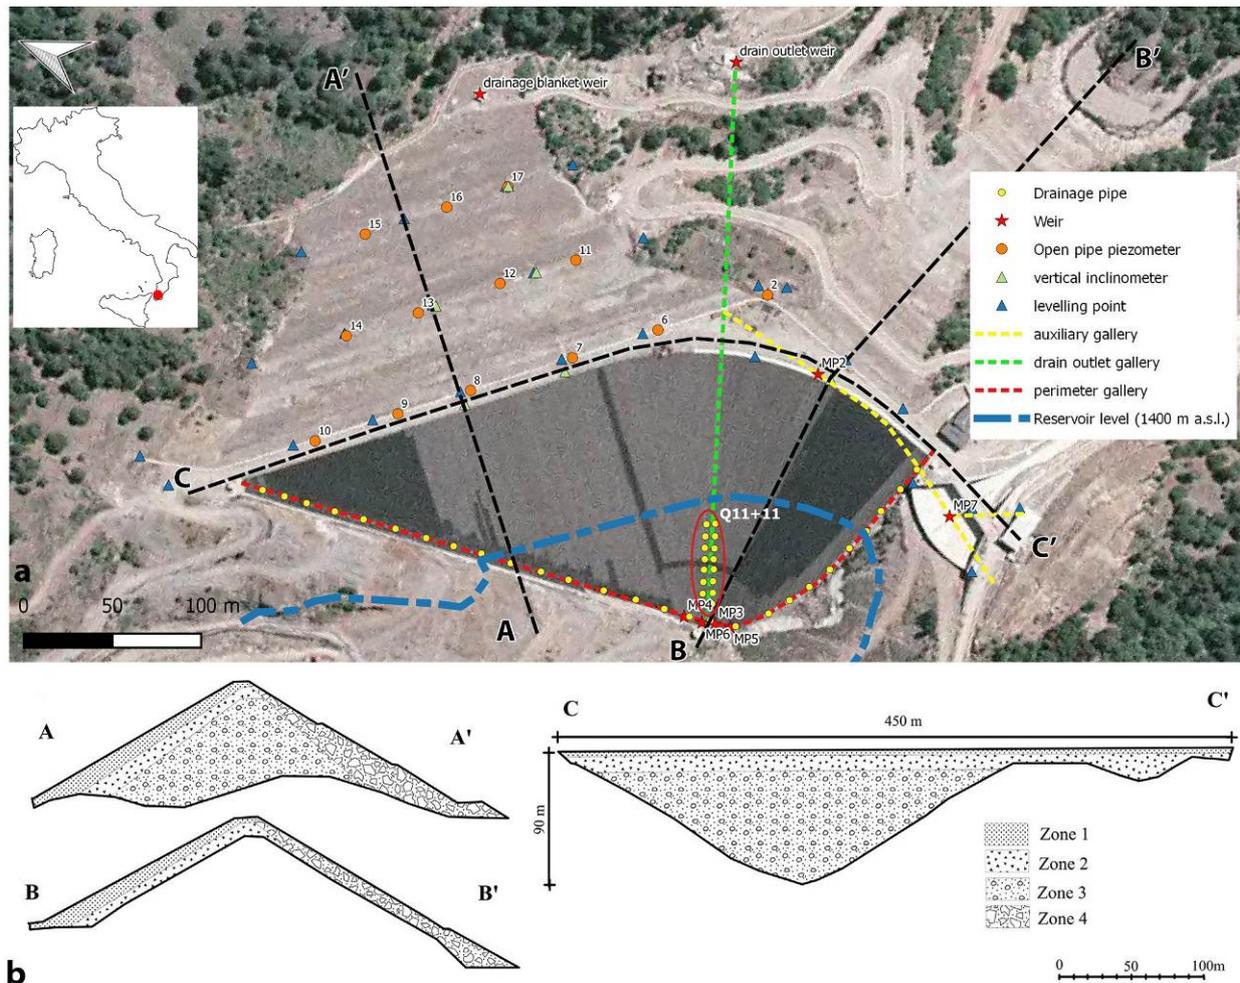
(a) Location, plan view and monitoring instruments of the Menta dam; (b) relevant cross sections of the dam's body (traces in panel a).
